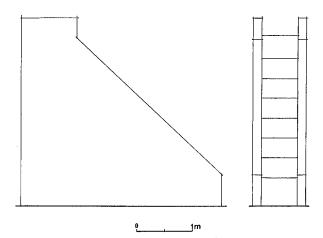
Varzana, Masğid-i Ğāmi^c: plan and elevation of minbar.
